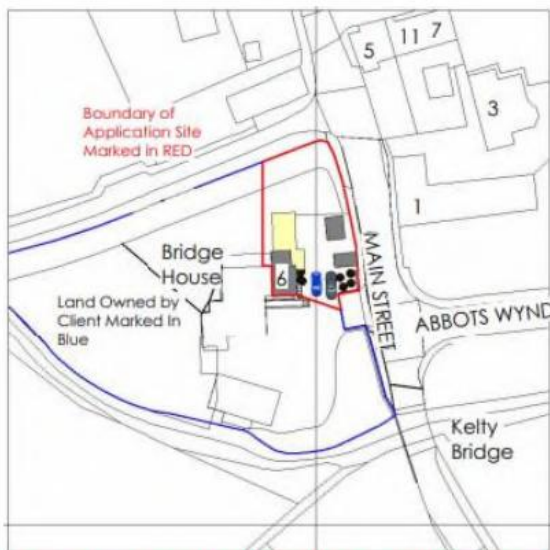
Location Plan detailing the area of garden ground for Bridge House outlined in blue.
